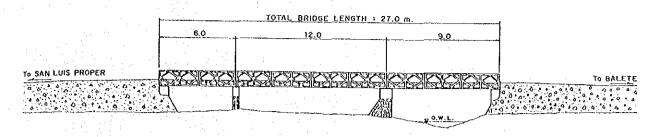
PLAN OF BANOYO RIVER (BS-50)
